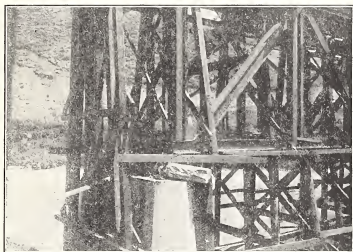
First Intermediate Pier, West End, Pájaro River Bridge, Southern Pacific Railroad.
